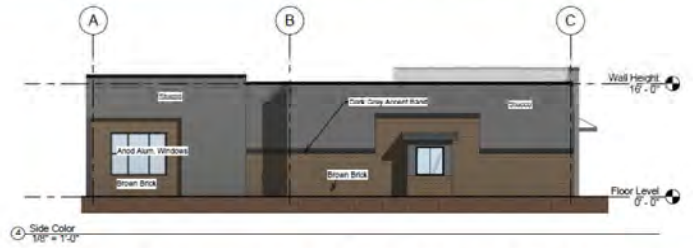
Restaurant/retail with drive-thru side elevation.
